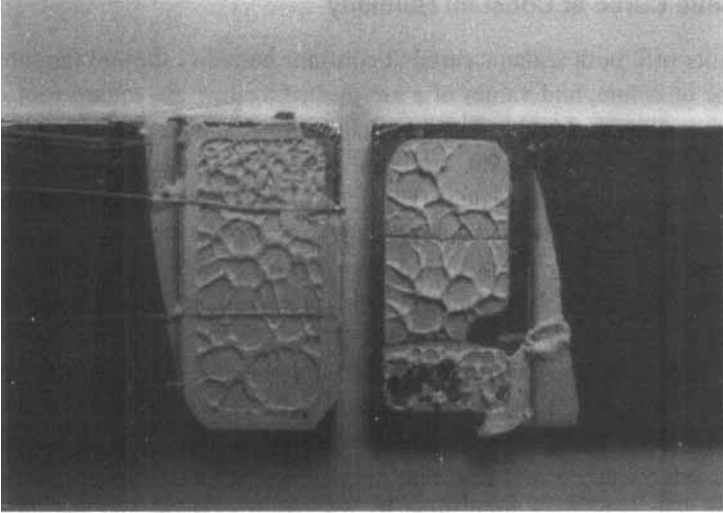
Failure surfaces of joints with fluorosilicone sealant after curing at 53.0% r.h. for 8.3 h.
